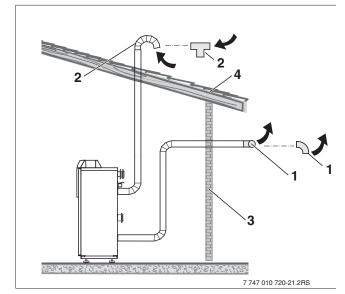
Roof-exit air supply pipe, wall-exit exhaust
